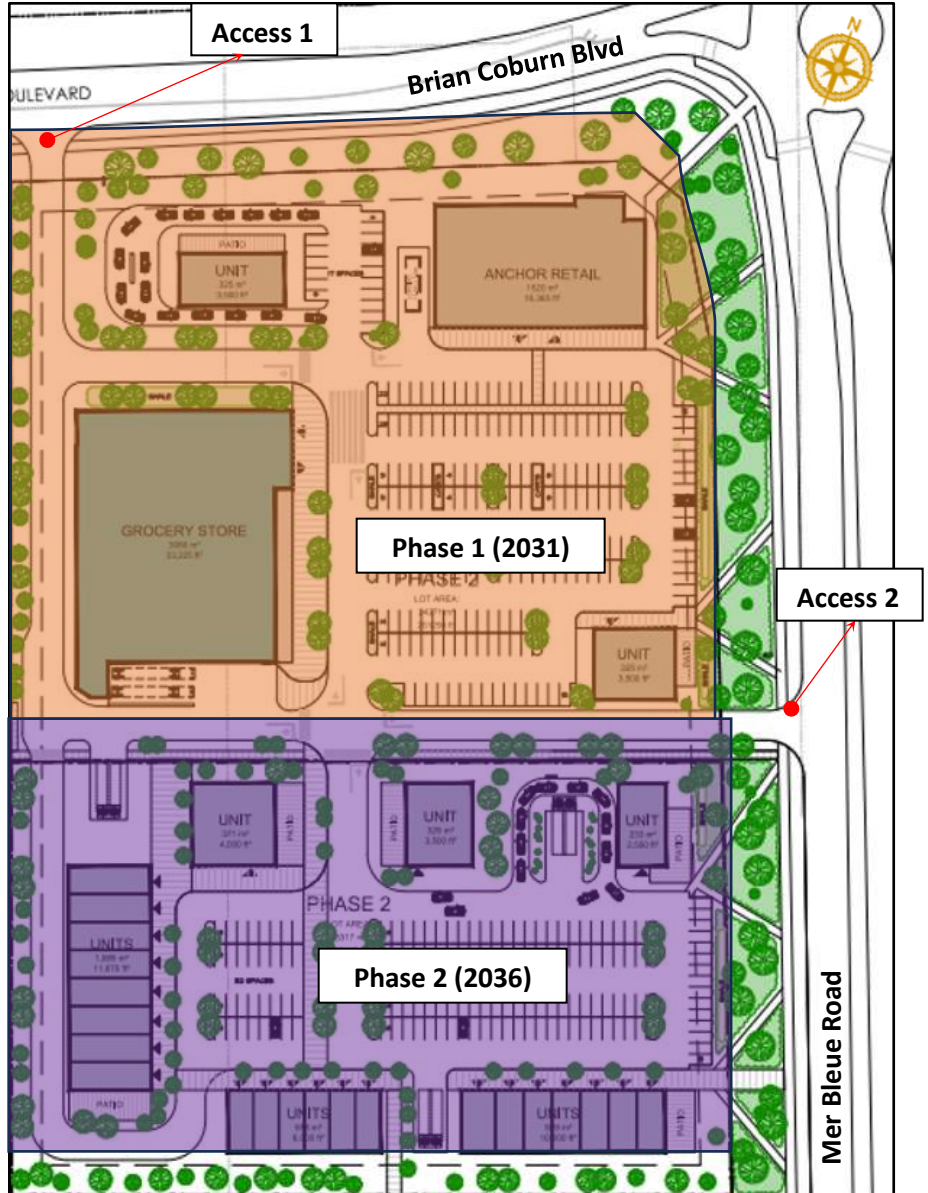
2226 Mer Bleue Road Site Plan
